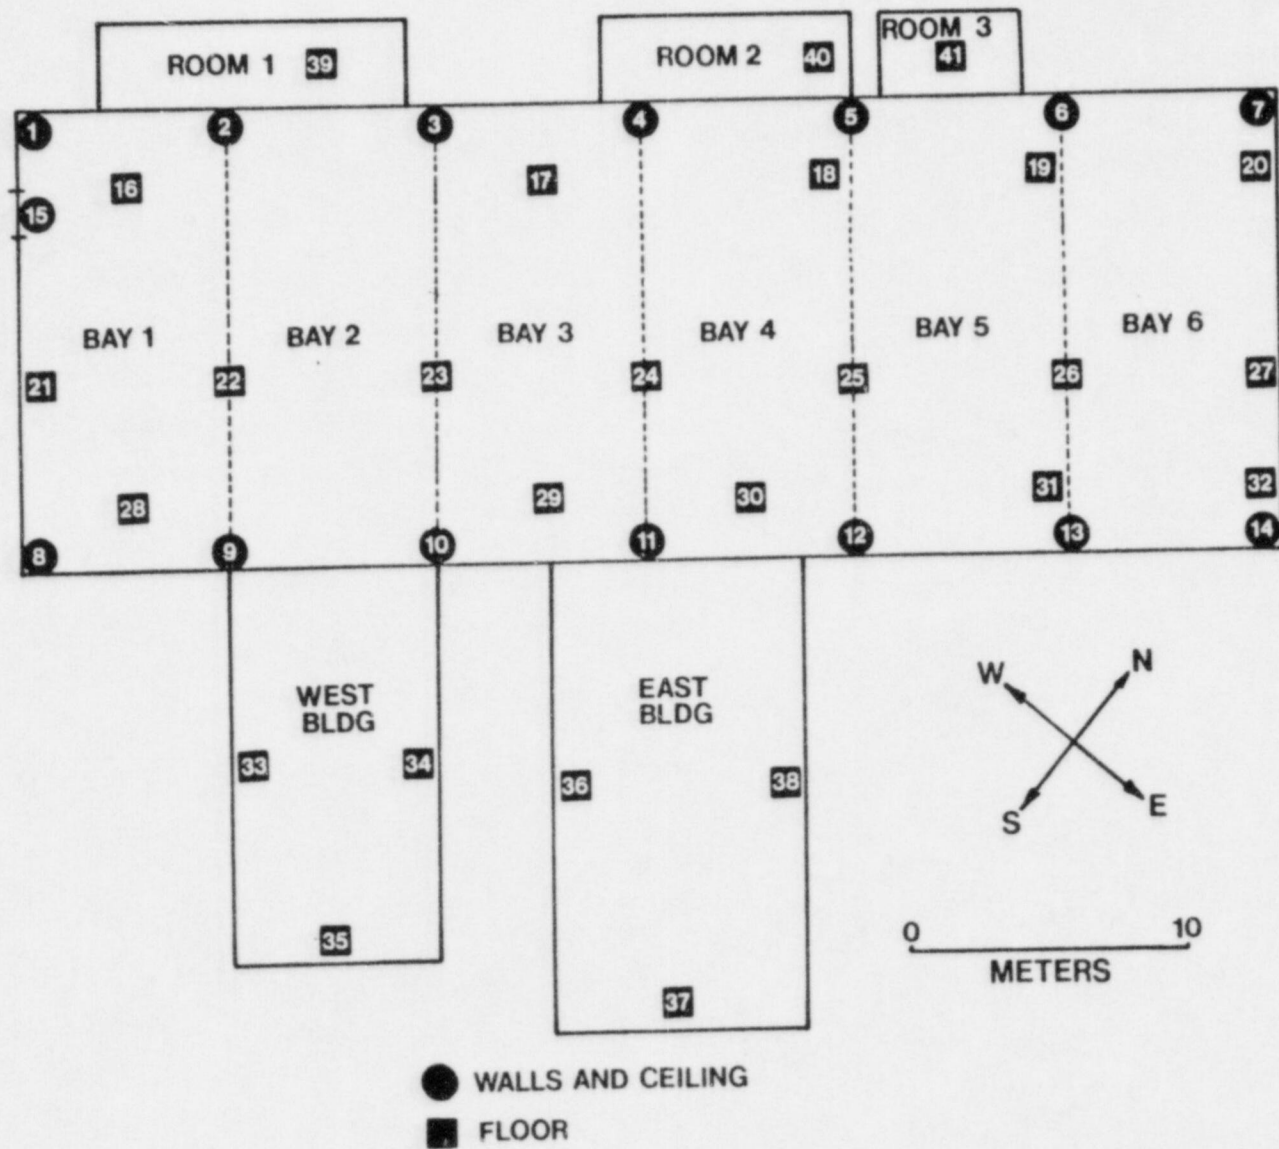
Floor Plan of the Old Melt Shop Indicating Locations of Measurements and Smears
